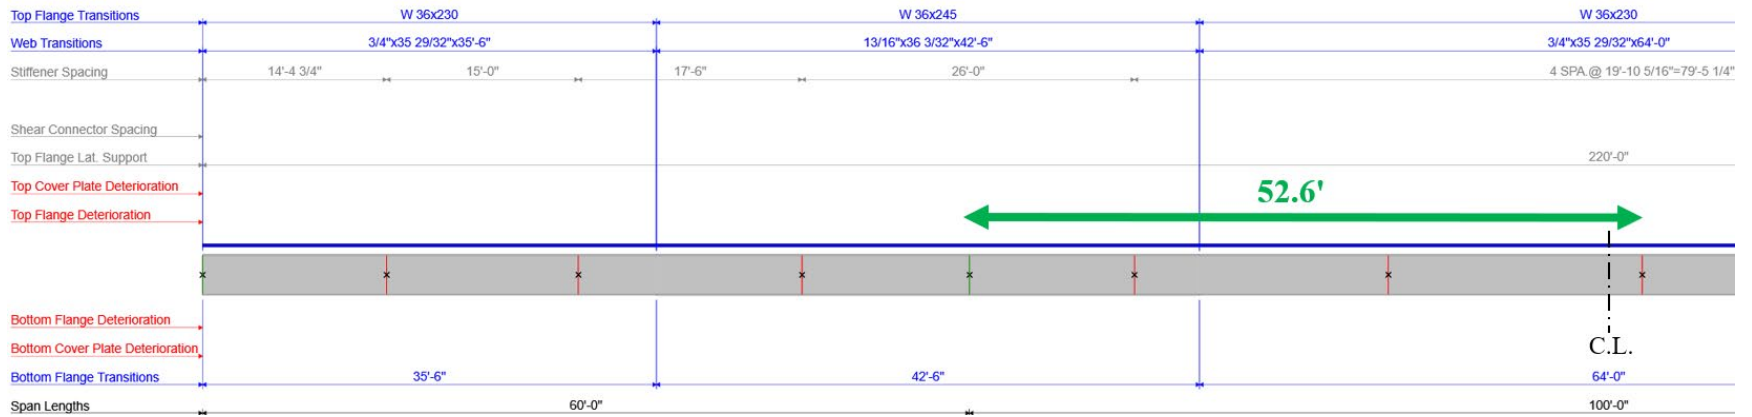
Bridge Girder Details for S080 40375 (AASHTOWare™ BrR, 2023)
